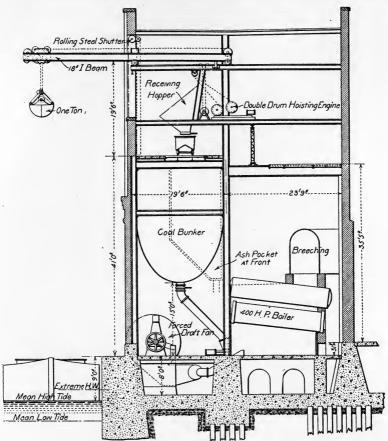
Boiler house, showing coal handling equipment. Hecker Flour Mills, New York.
